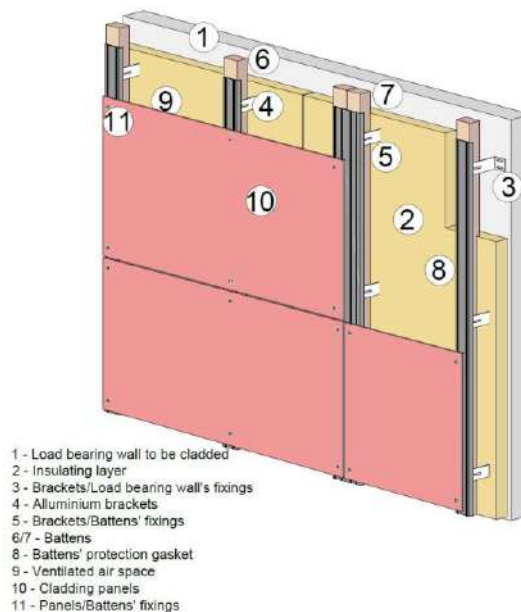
Example of a ventilated facade package with a wooden subframe, mounted on the load-bearing wall
